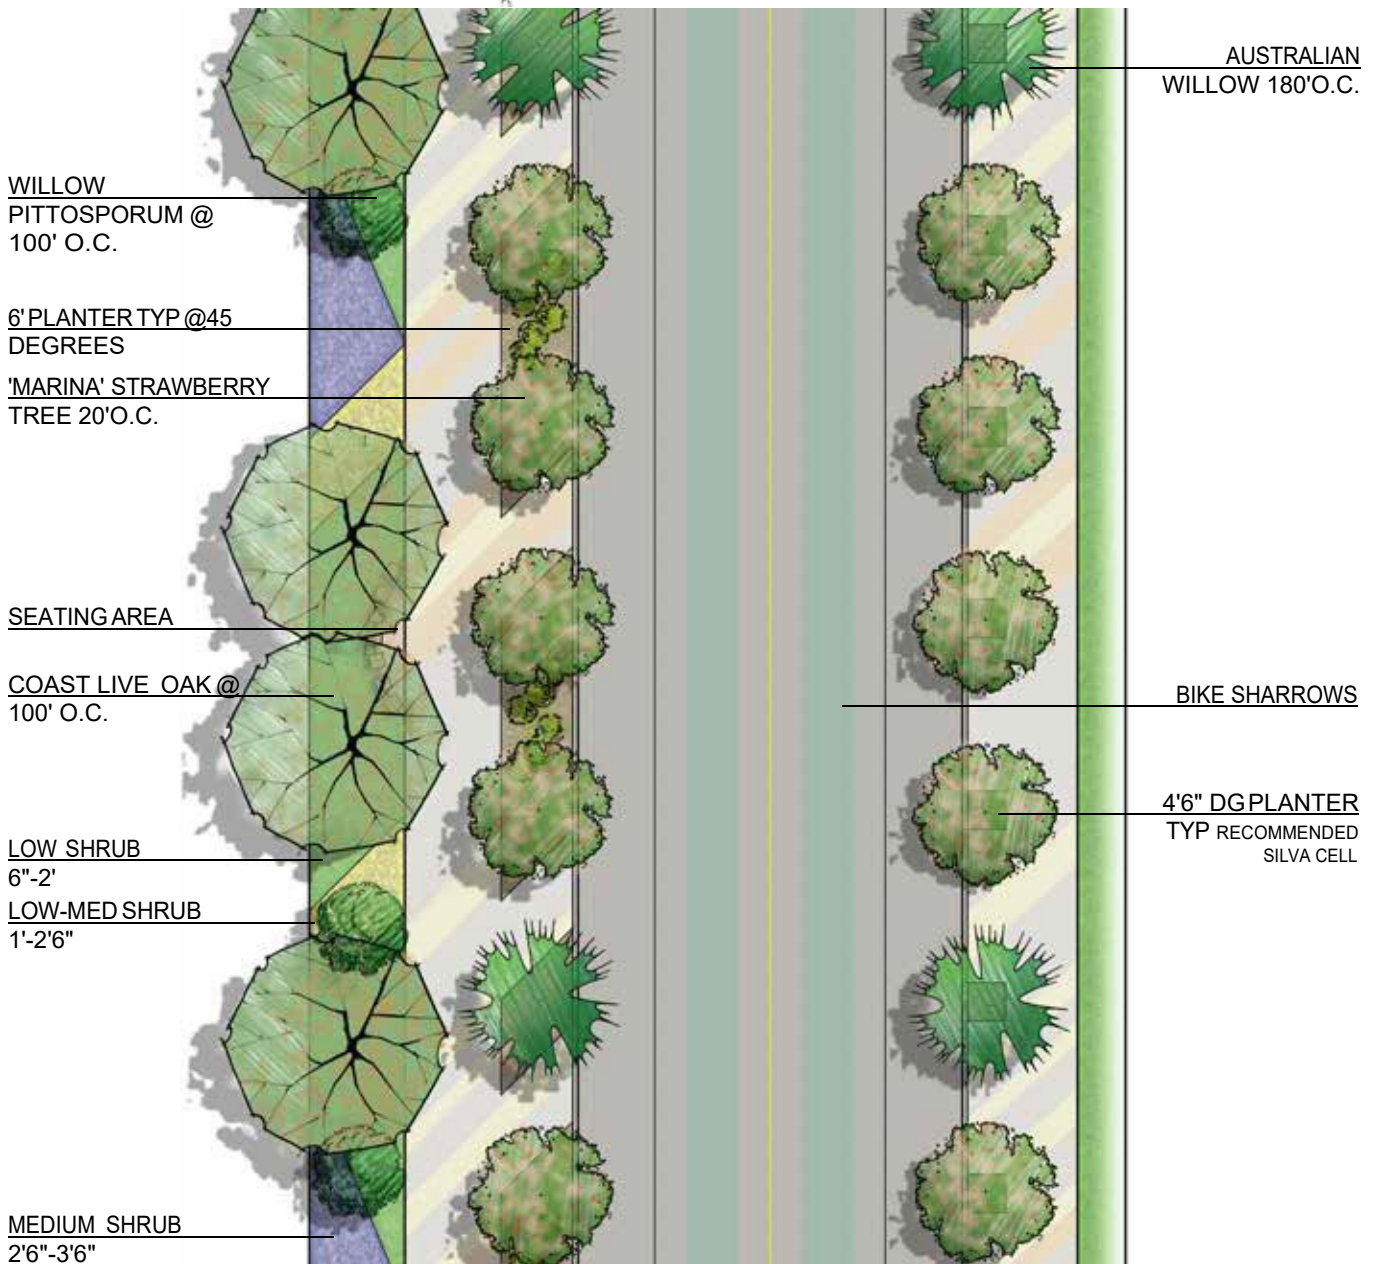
Street Trees: 220th Street (East of S. Vermont Avenue)
